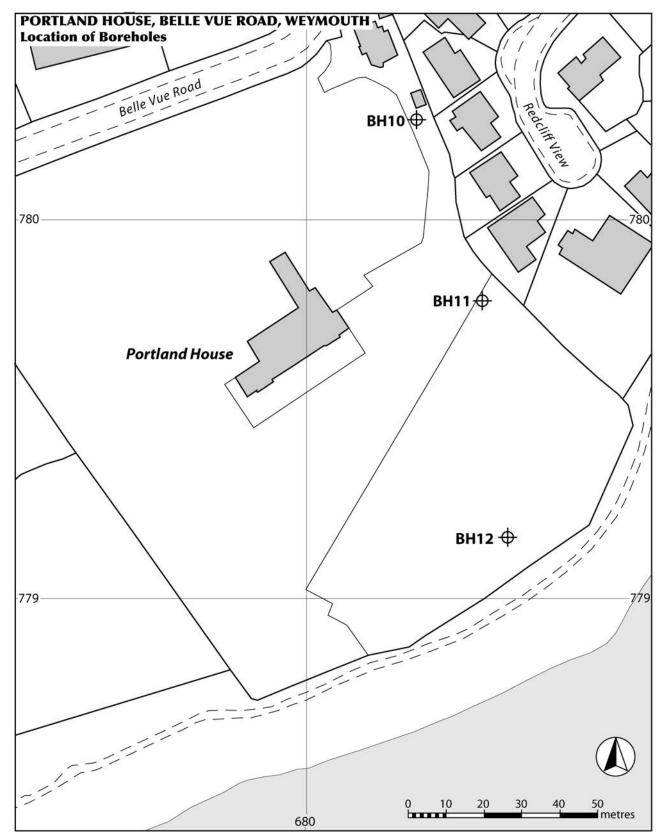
Site plan showing location of Boreholes BH10-BH12 (from a plan provided by the Client)
